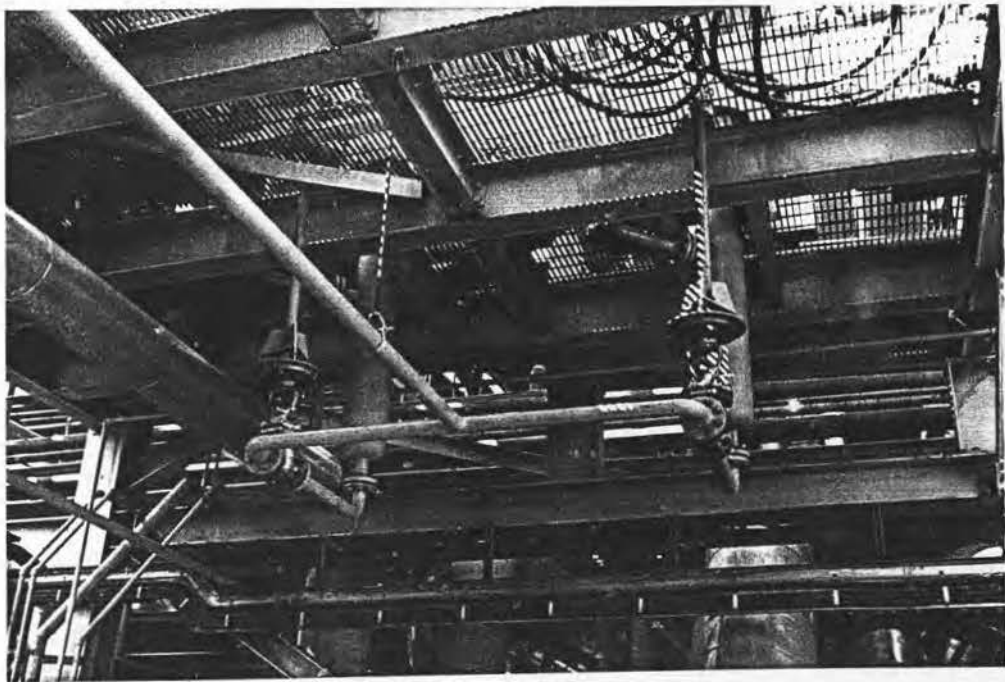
PLANT BYPASS INSTALLATION VIEWED FROM THE BOTTOM
